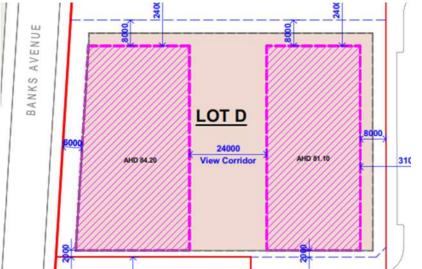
Building envelopes extract from approved Concept Plan (DA-2019/386)
